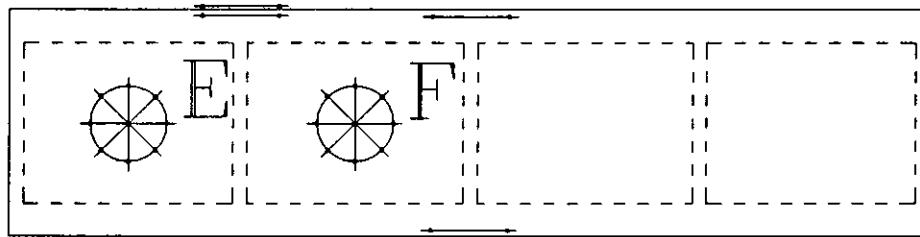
Pilot test beam Demec gauge placement on Panels E and F
